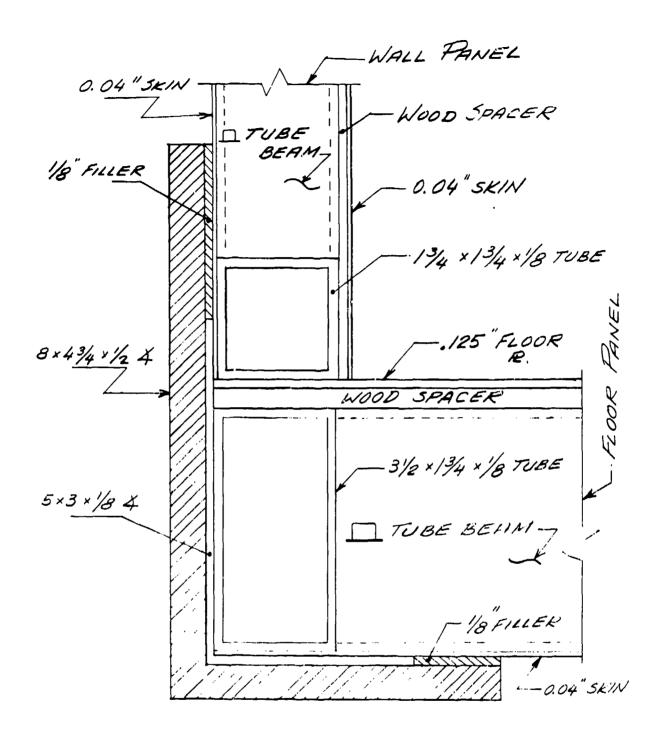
Floor to Wall Joint, Reinforced (Shaded Parts are Reinforcements)
